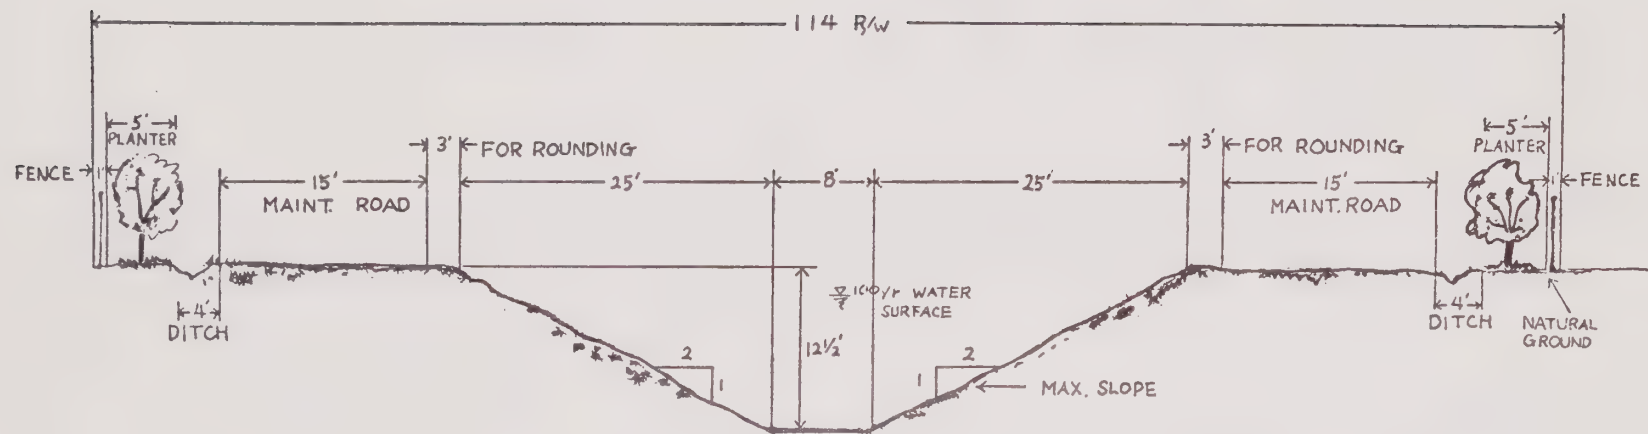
TYPICAL SECTION FOR TRAPEZOIDAL CHANNEL WITH NO DEPRESSED ROAD
